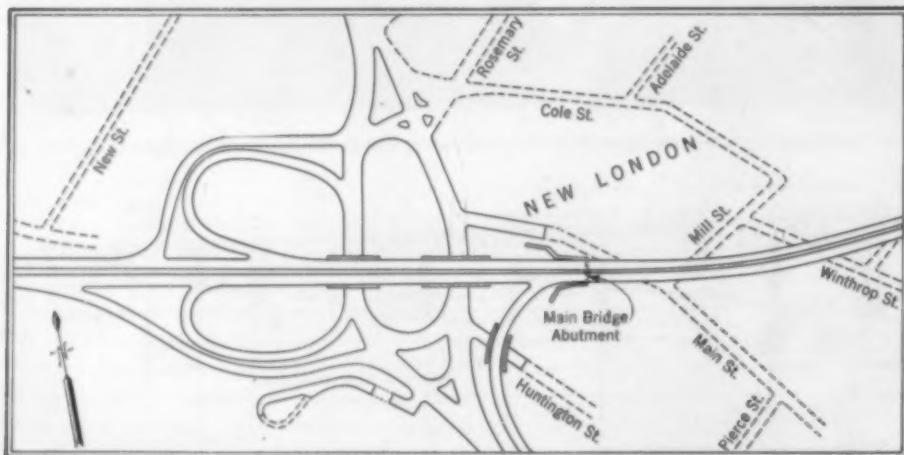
NEW LONDON APPROACH TO THAMES RIVER HIGHWAY BRIDGE
